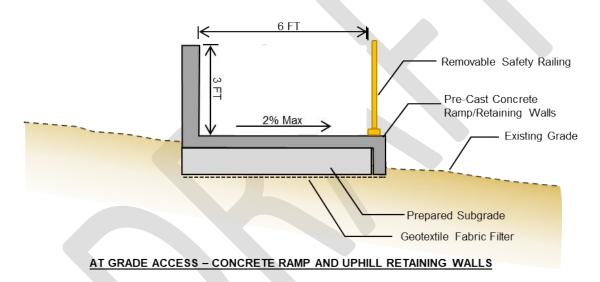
At Grade Access - Concrete Ramp and Uphill Retaining Wall Schematic
